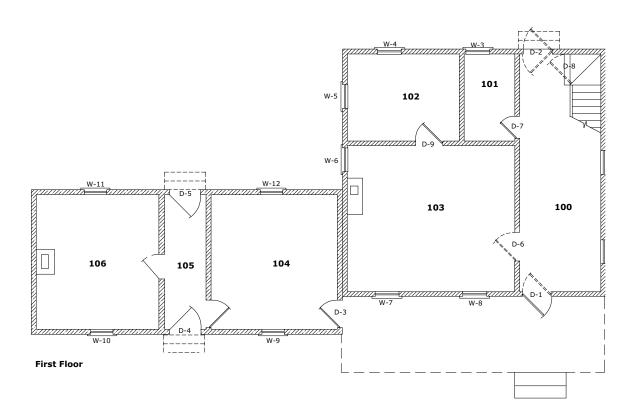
Floor plans of existing building. (I. Jones, NPS-SERO-CR, 2003)
